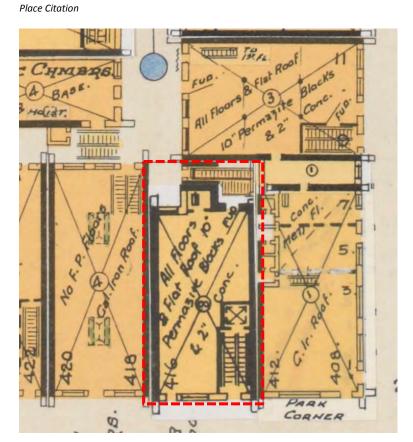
Detail of Mahlstedt fire insurance plan, Map 13, 1948 showing the eight storey warehouse at 414-416 Bourke Street
